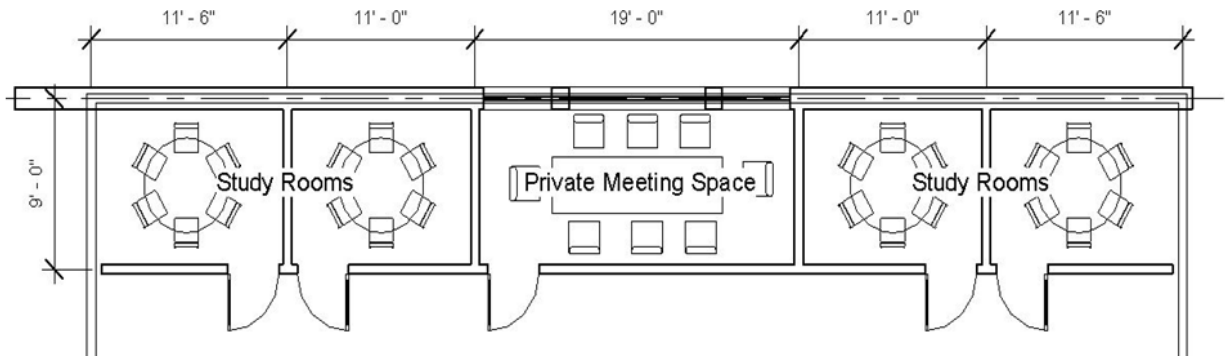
Proposed subsections of study rooms and private conference room in interior layout.
